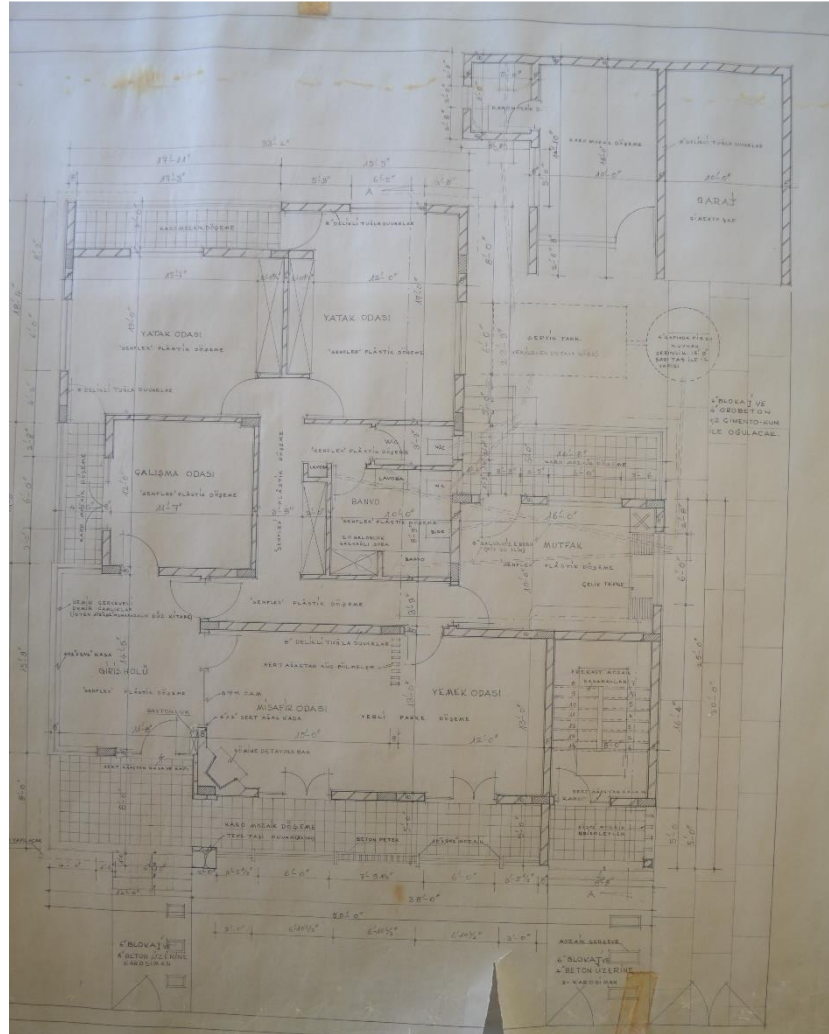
The original ground floor of Adnan Tahsin House (from Abdullah Onar archive with the permission of Anber Onar)
